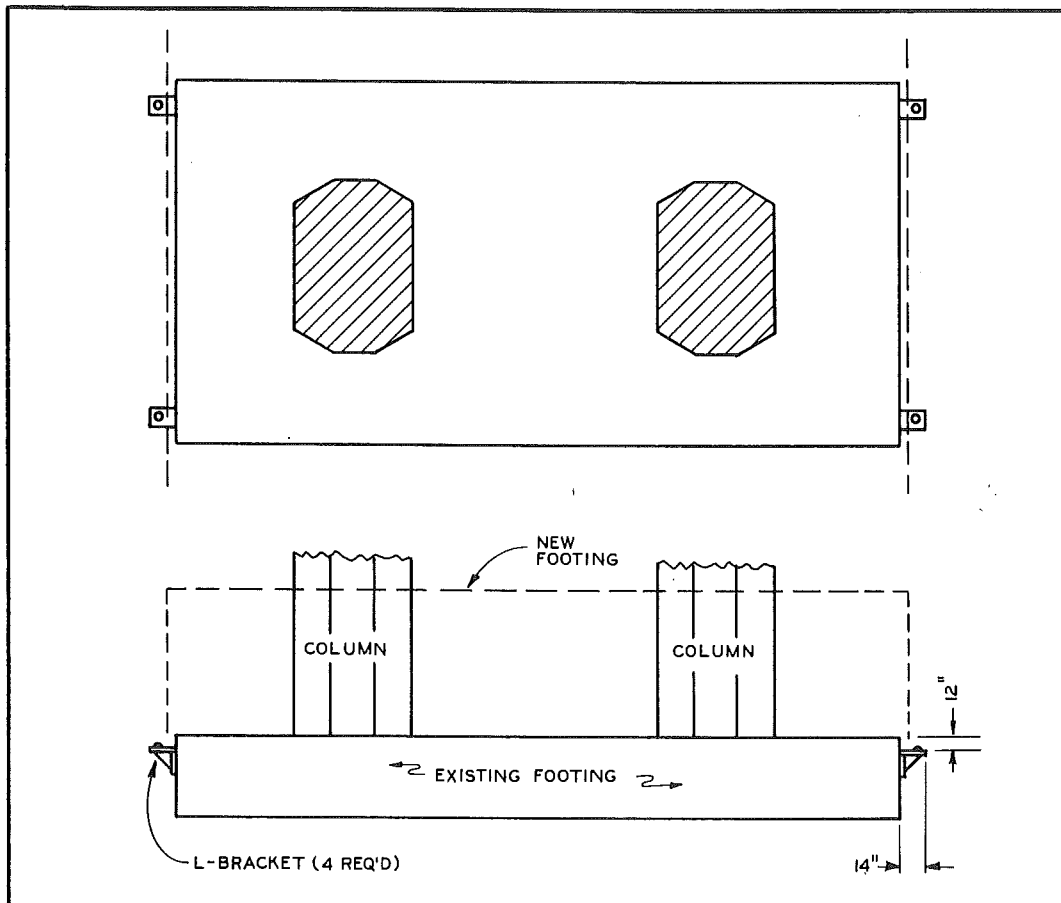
Brackets for establishing elevation of old footing after new footing was in place.
